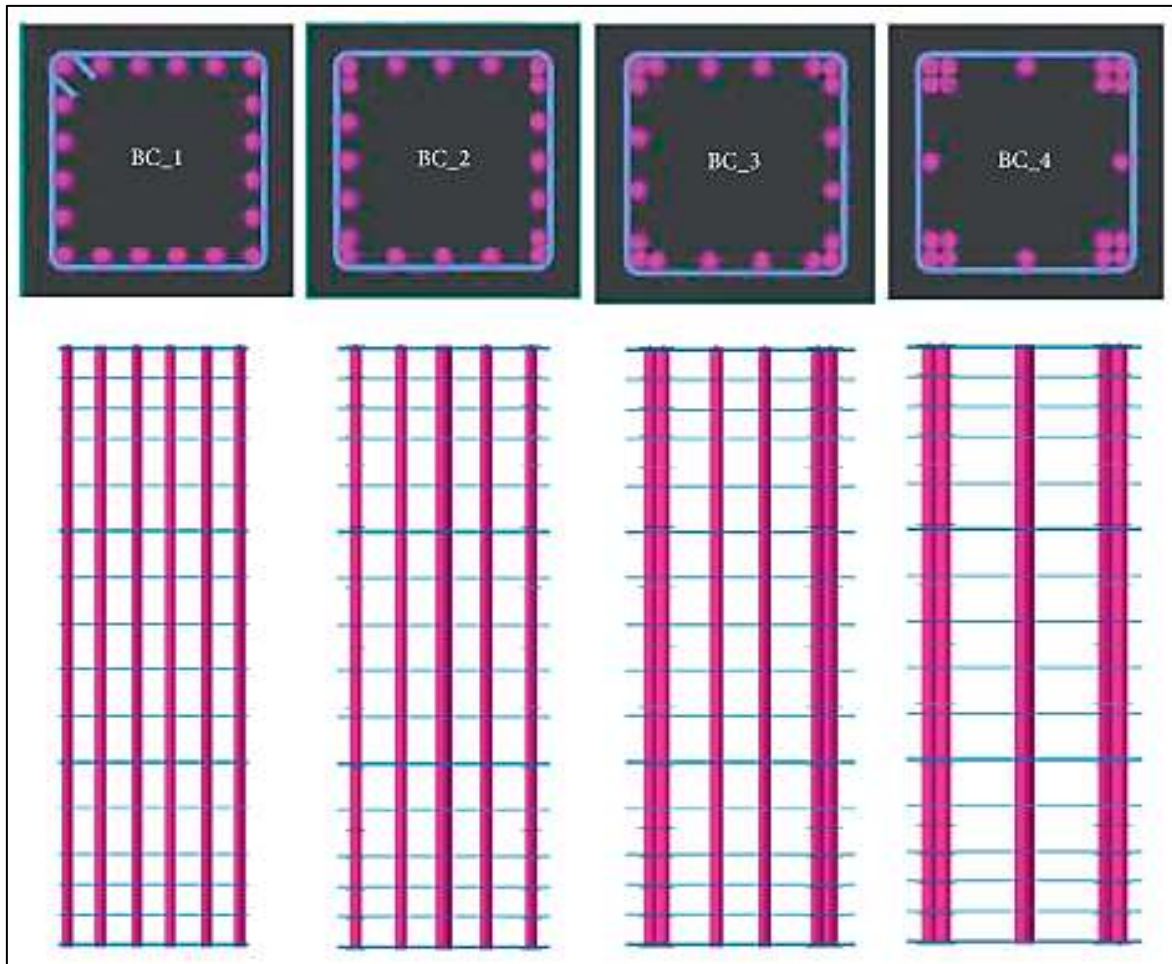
Cross-Sectional and Longitudinal BRC Column Specimen Detailin[13].
